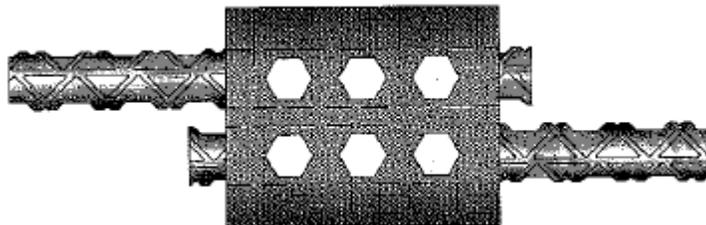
Typical Mechanical Coupler for Reinforcing Steel
